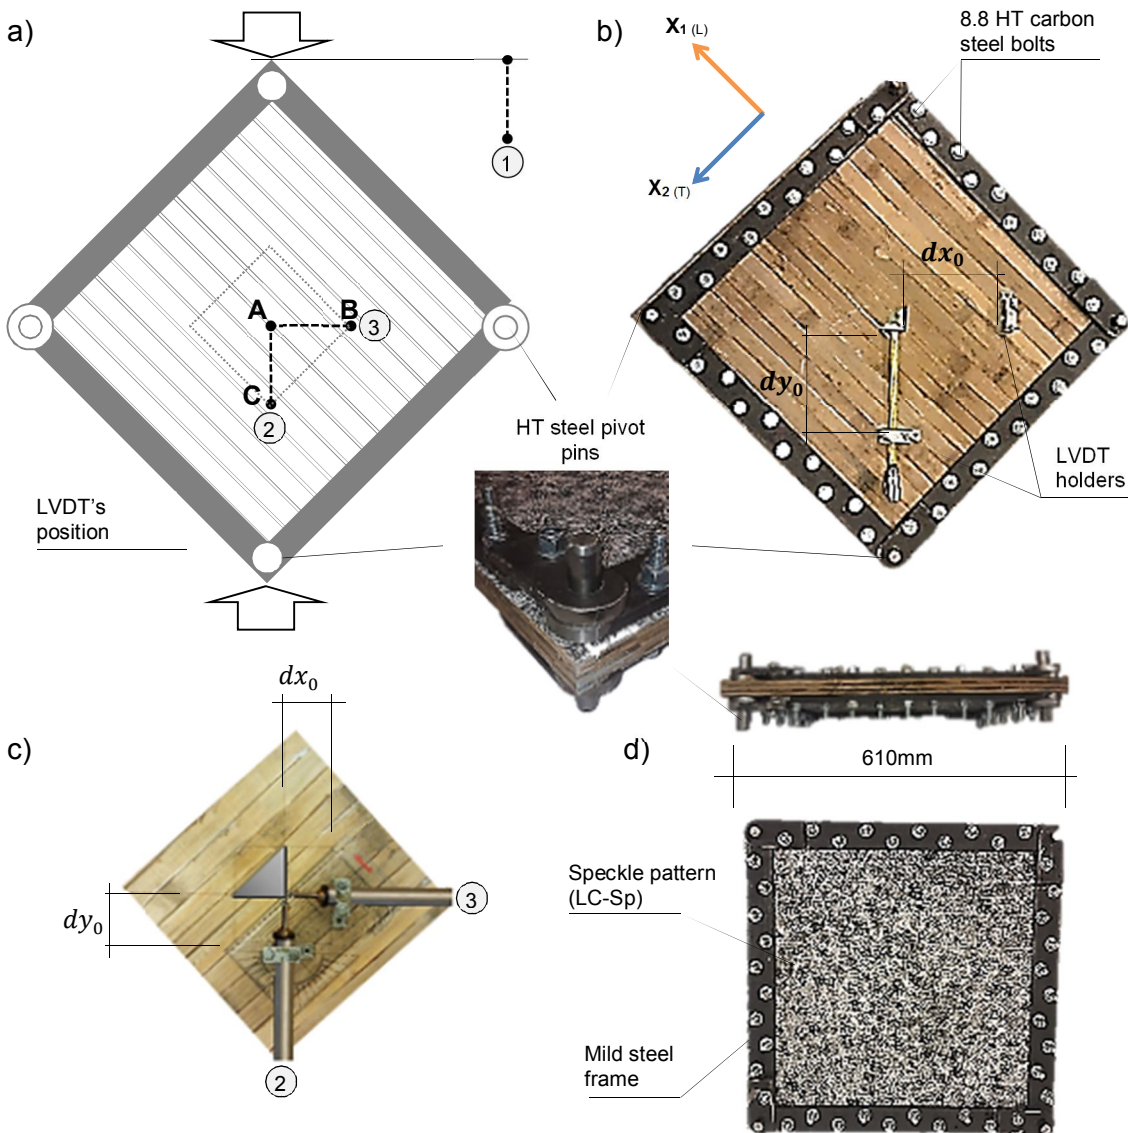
Details of the specimen and measurement techniques used for picture frame shear test.
